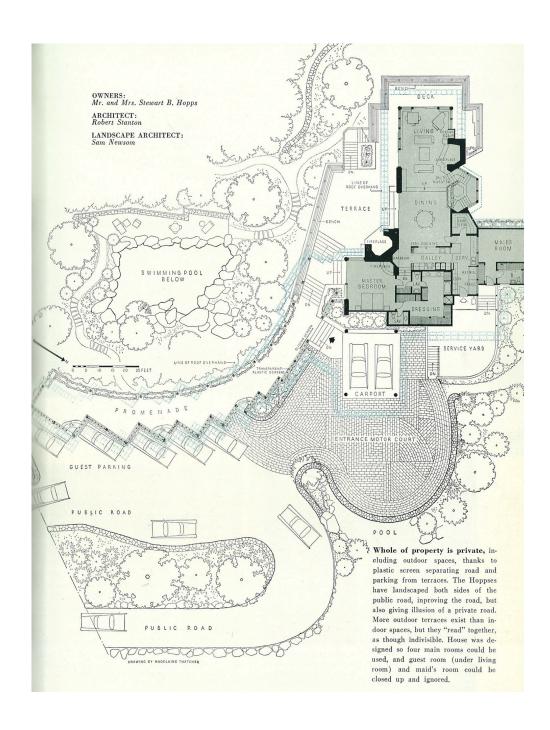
Floor Plans, Robert Stanton, "Home Plans," House Beautiful, November 1957: 257.
